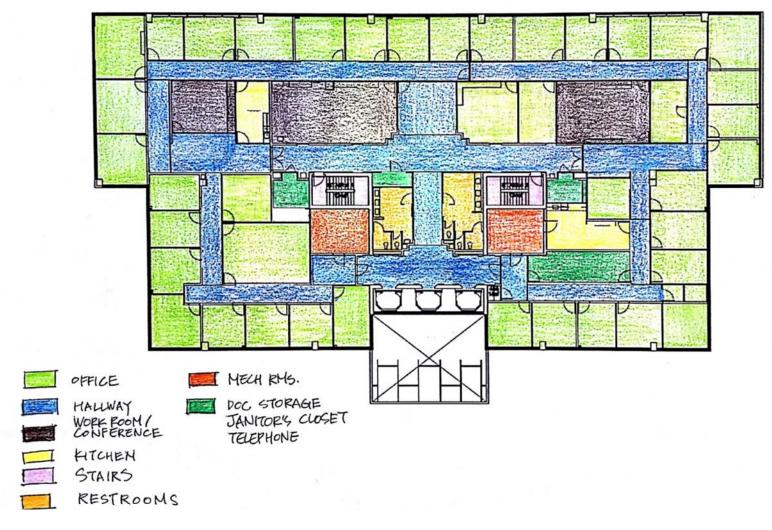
Fourth Floor Space Usage Plan for the JBC Building
